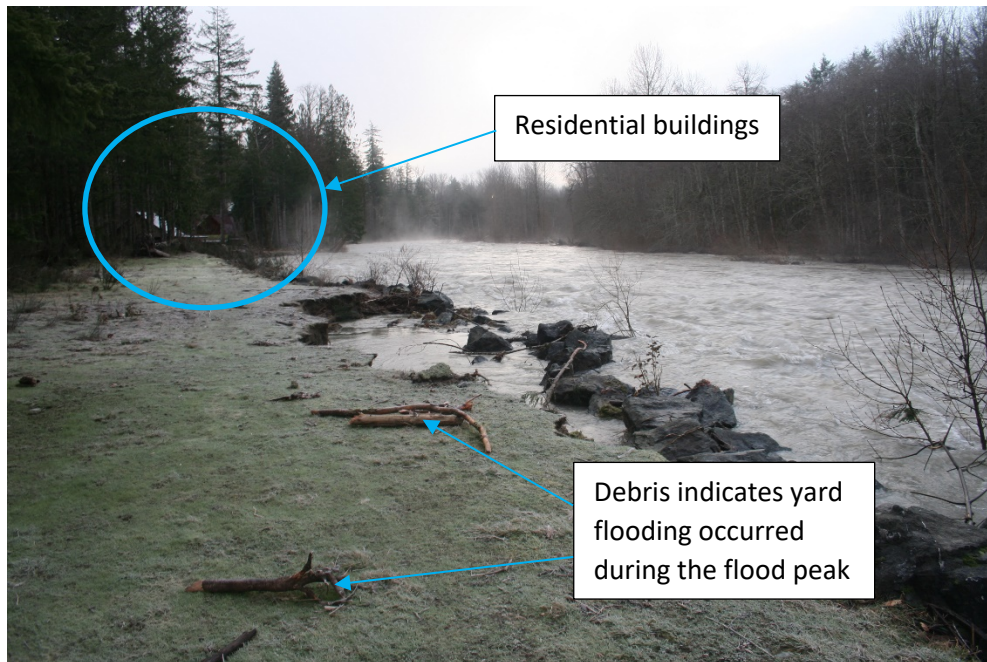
Example of private property flooding on 1 February 2020. Yard areas were flooded but water levels reached few buildings. Riprap revetments were overtopped, resulting in bank washout
